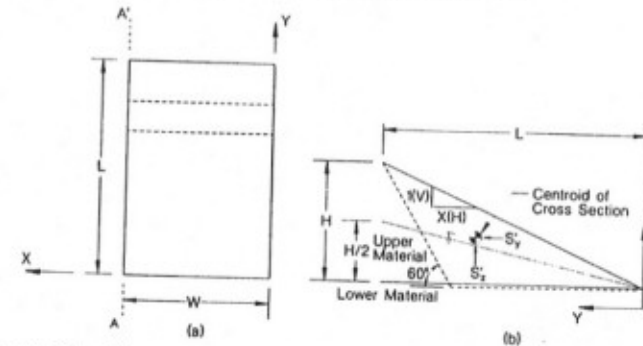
Plan View and Representative Cross Section for Slope Model: (a) Plan View; (b) Cross Section A-A'
